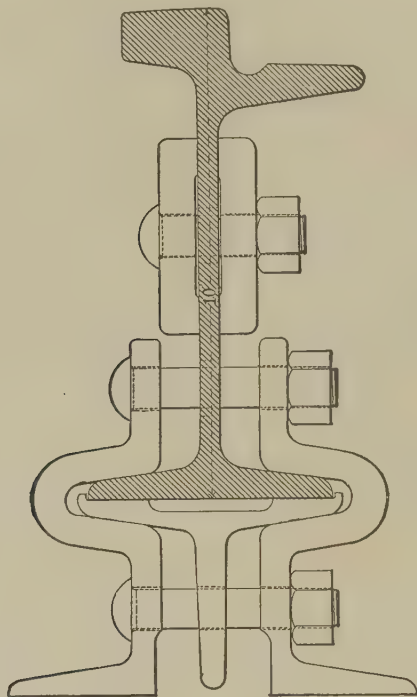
PROPOSED HIGH GIRDER RAIL—BOSTON TYPE.
